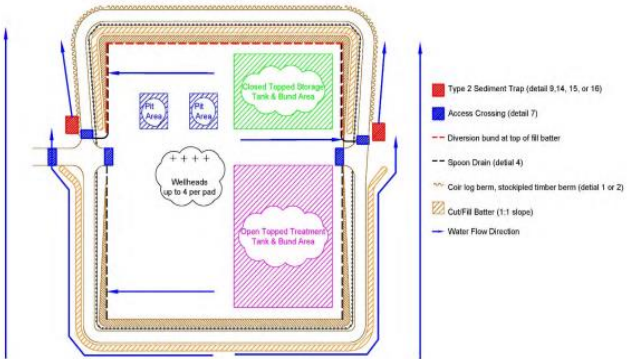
EP187 Indicative Multiwell Wellpad, Cut and Fill layout
